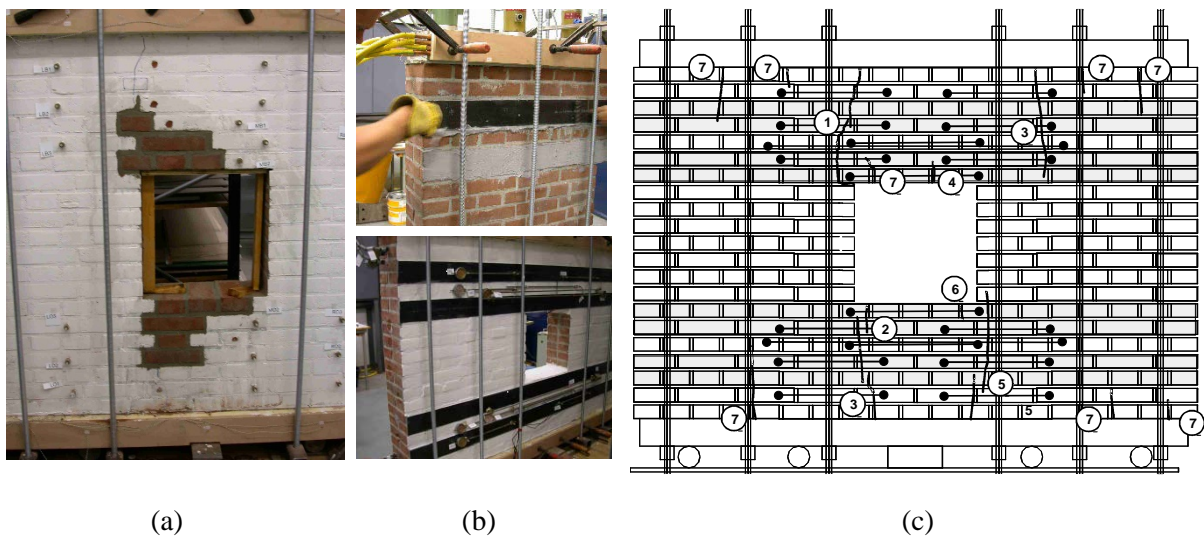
(a) Masonry wall repair, (b) CFRP strip application and (c) cracking upon re-testing (Van Zijl and de Vries 2005).
